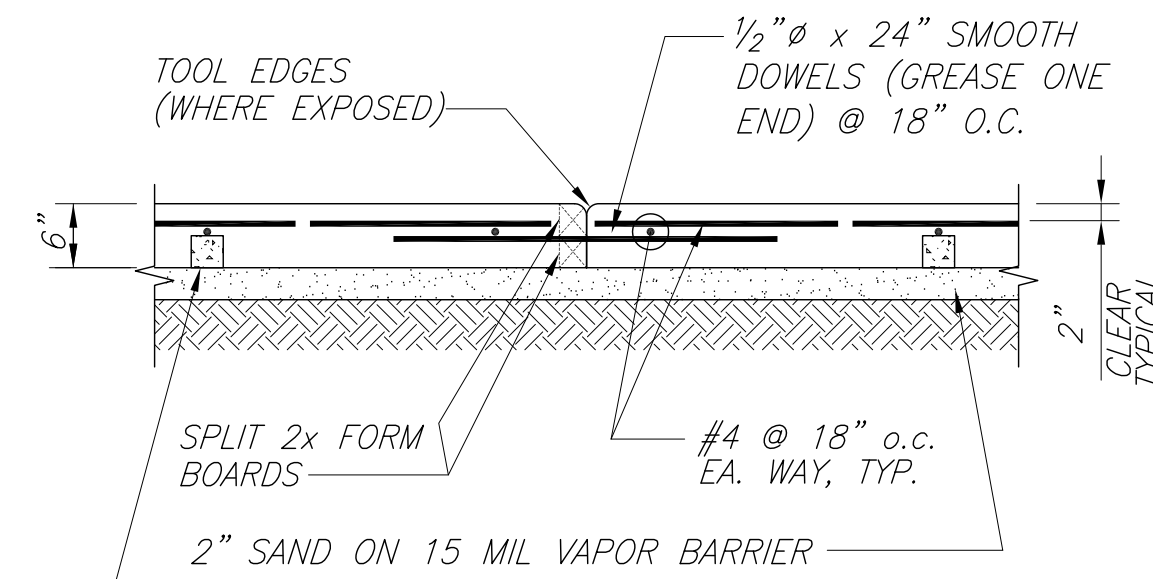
DETAIL WHERE BOTTOM REINFORCING BAR IS CUT
